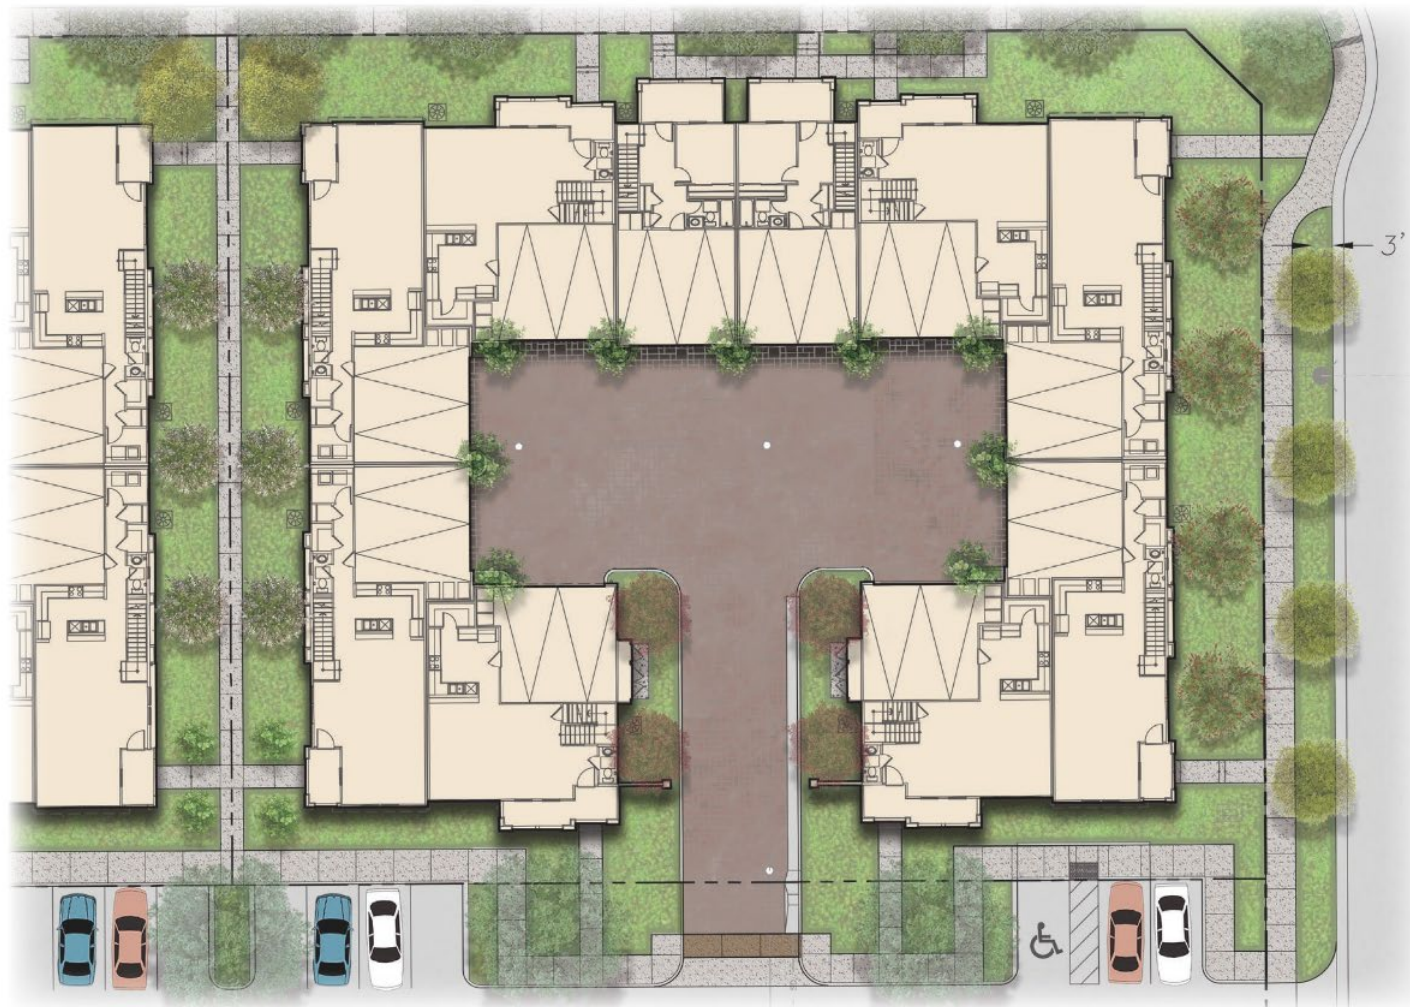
TYPICAL ROW TOWNHOMES PAVING LAYOUT (ENLARGED)
